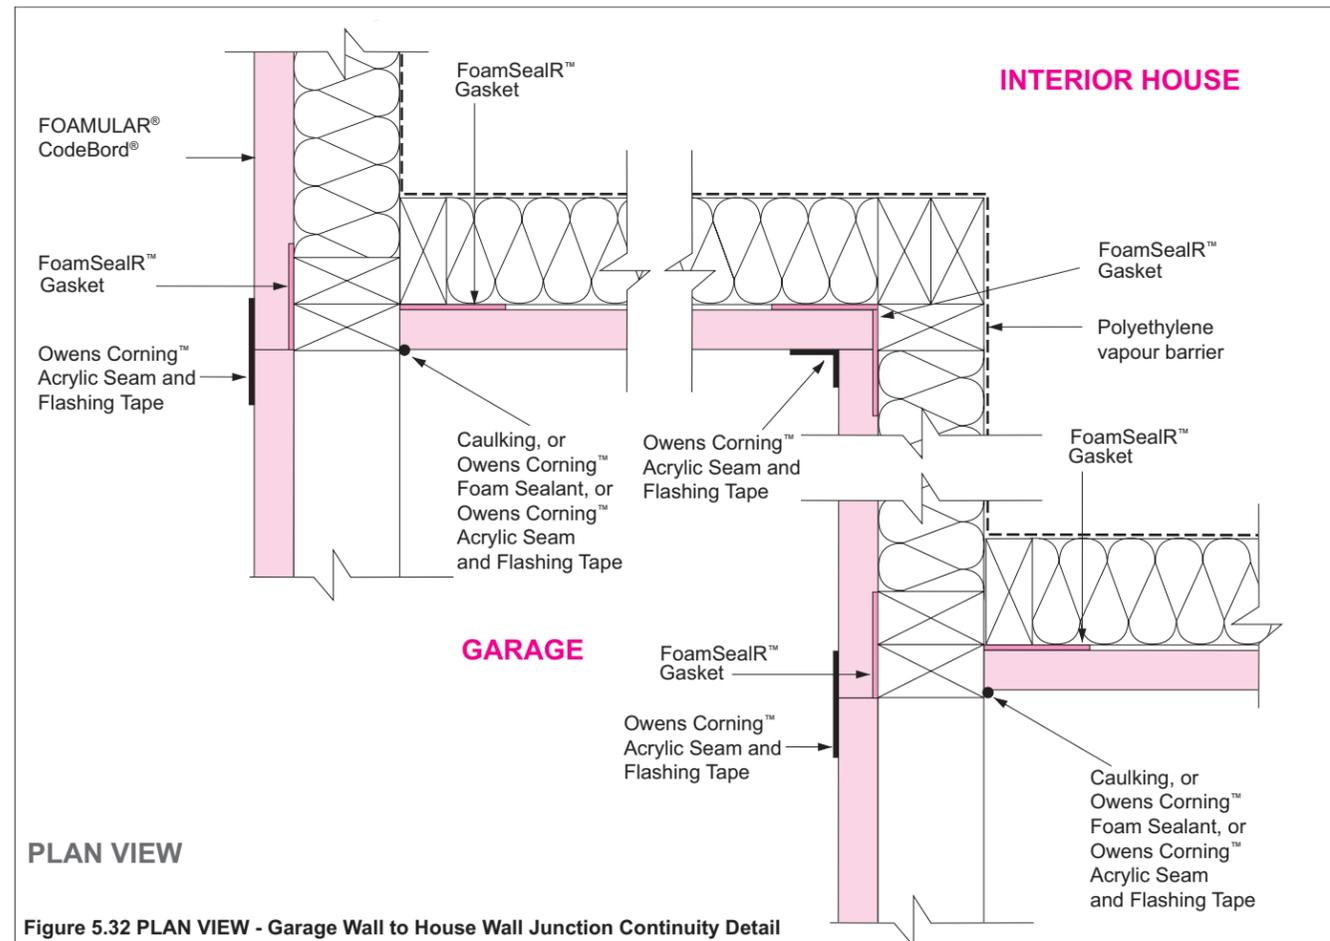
PLAN VIEW - Garage Wall to House Wall Junction Continuity Detail
